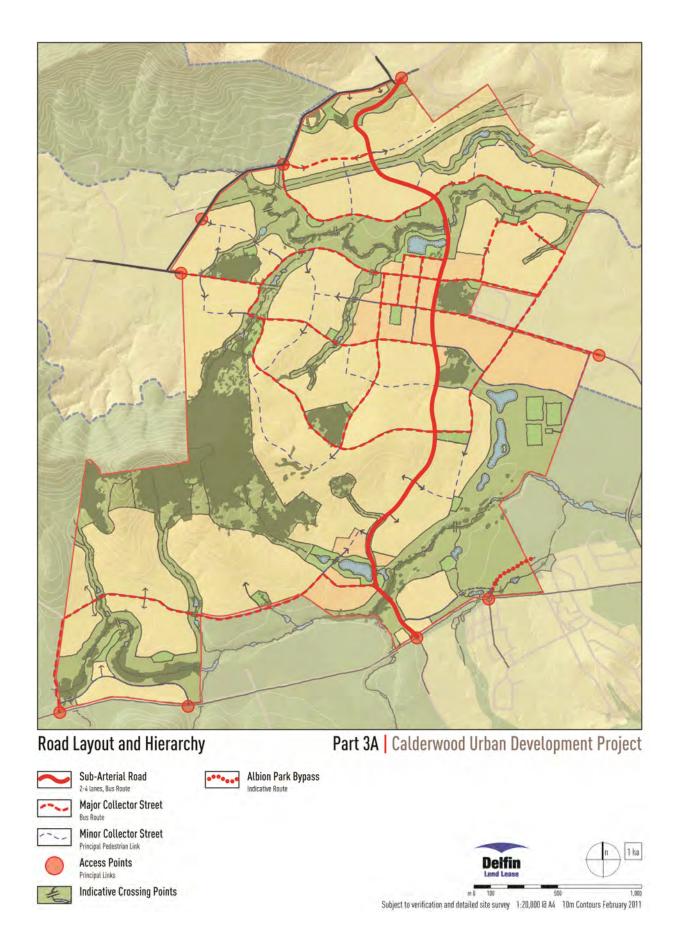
Approved Concept Plan Road Layout and Hierarchy
